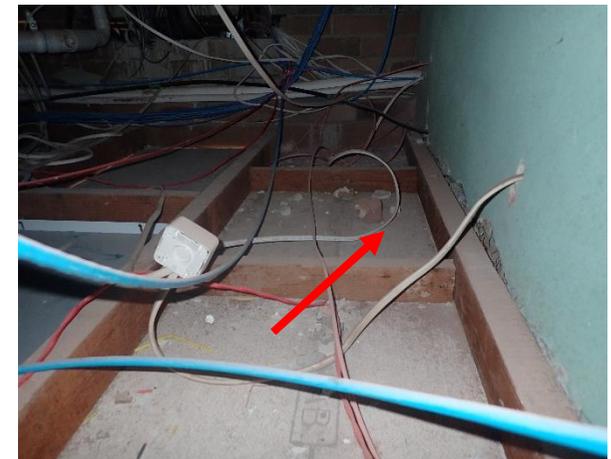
Hawthorne Building – Roof void – Lead containing dust
